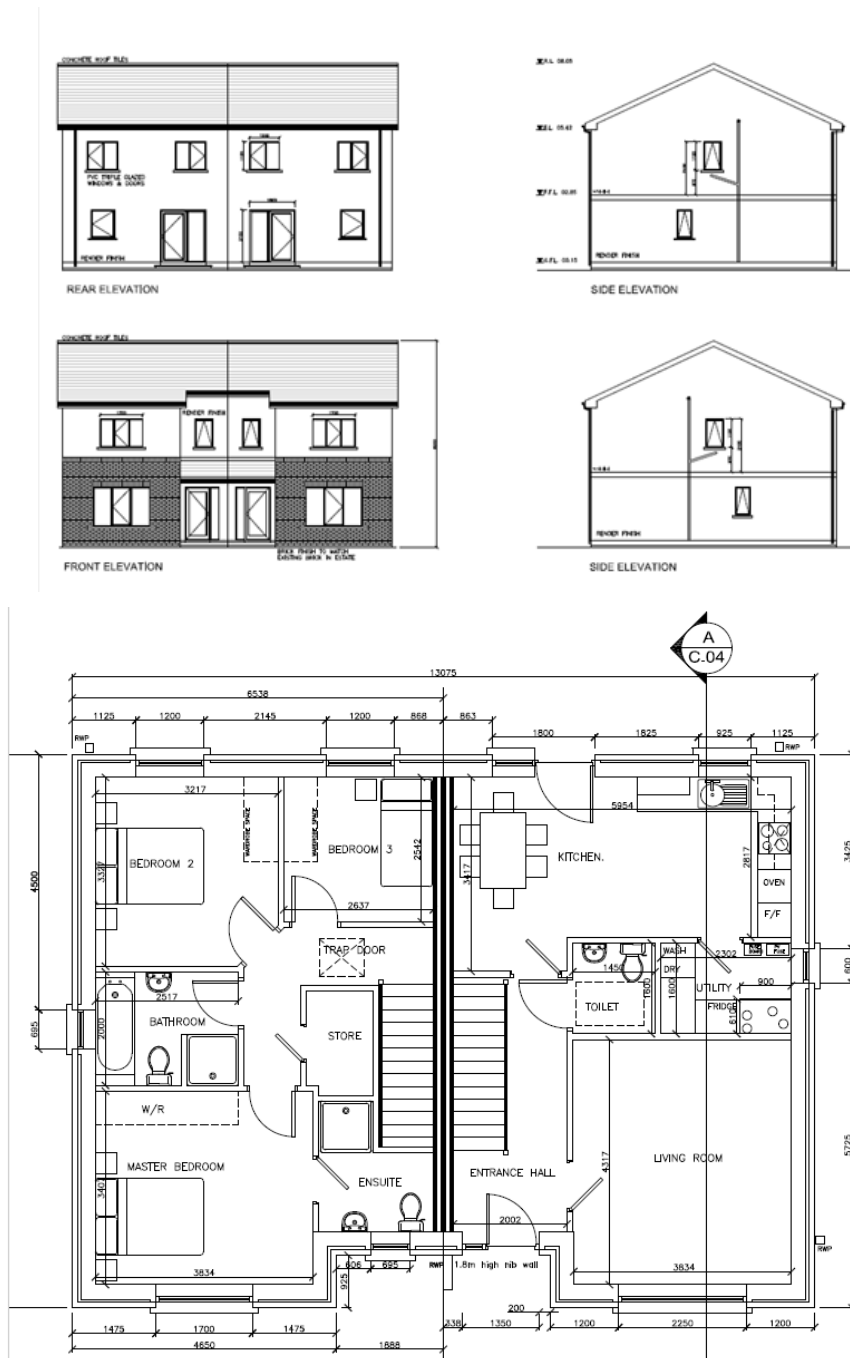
Elevations and ground floor plans of case study nZEB homes.
